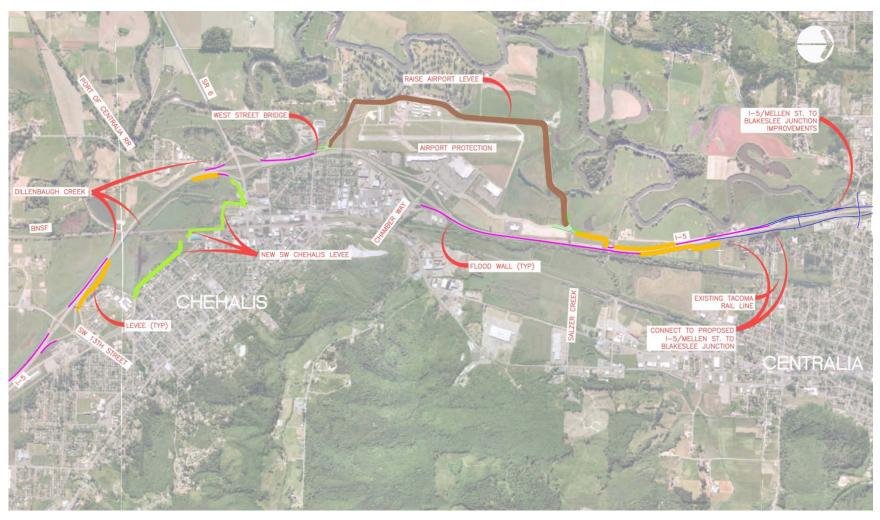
Alternative 1 - I-5 Levees and Walls, Raise Airport Levee, New SW Chehalis Levee
